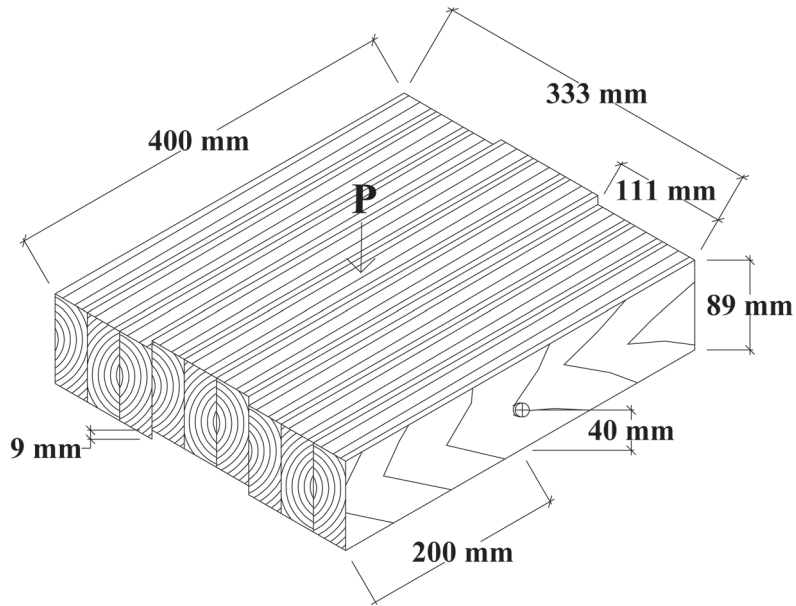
Shearing test of a glulam connection with pressure (P) applied perpendicular to the grain.
